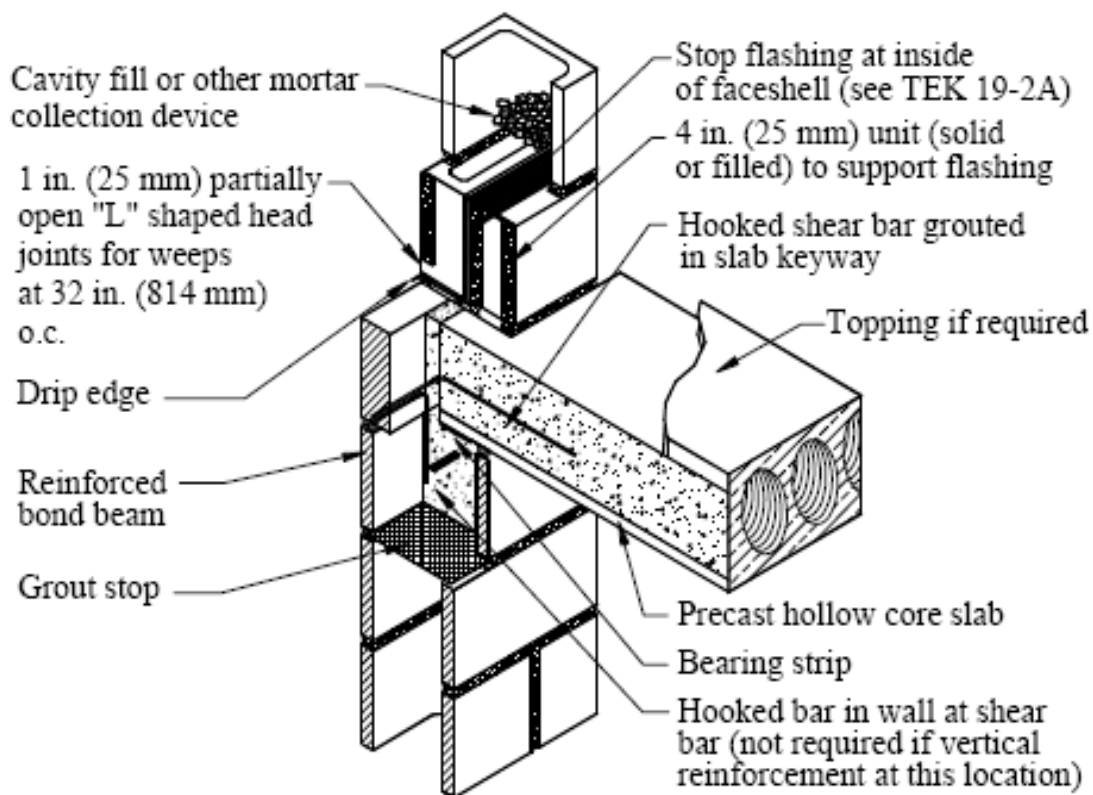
Bearing Wall floor/roof system. Courtesy of NCMA TEK 5-7A
